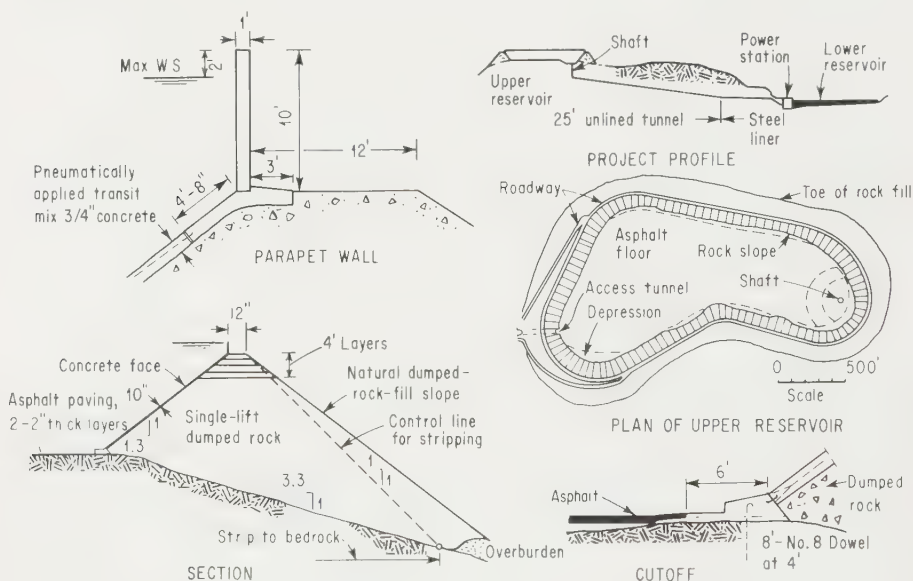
Taum Sauk Dam. (Union Electric Co., St. Louis, Mo.)
